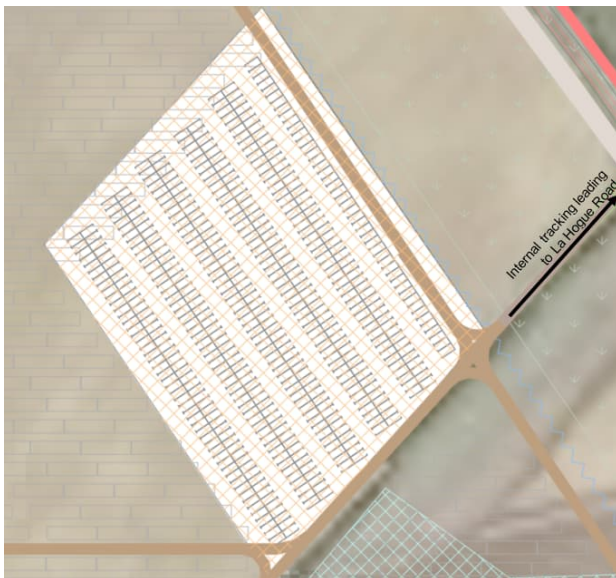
Indicative Car Park Layout – Sunnica West (La Hogue Road)
